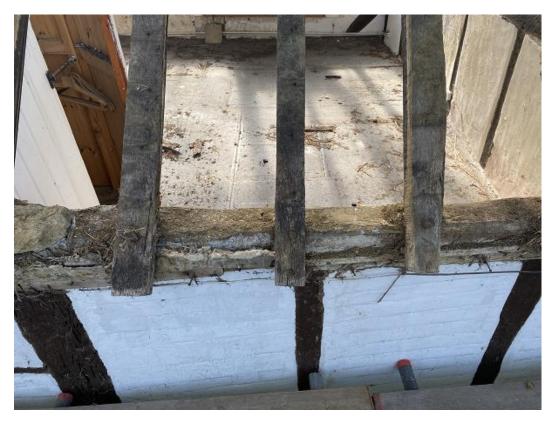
North-facing roof slope looking south, showing pegged connection of rafters into wall plate
